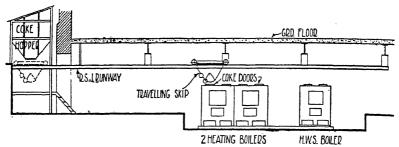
Typical Longitudinal Section of a Boiler House, showing Magazine-Type Boiler fed by Travelling Skip from Hopper at side.
